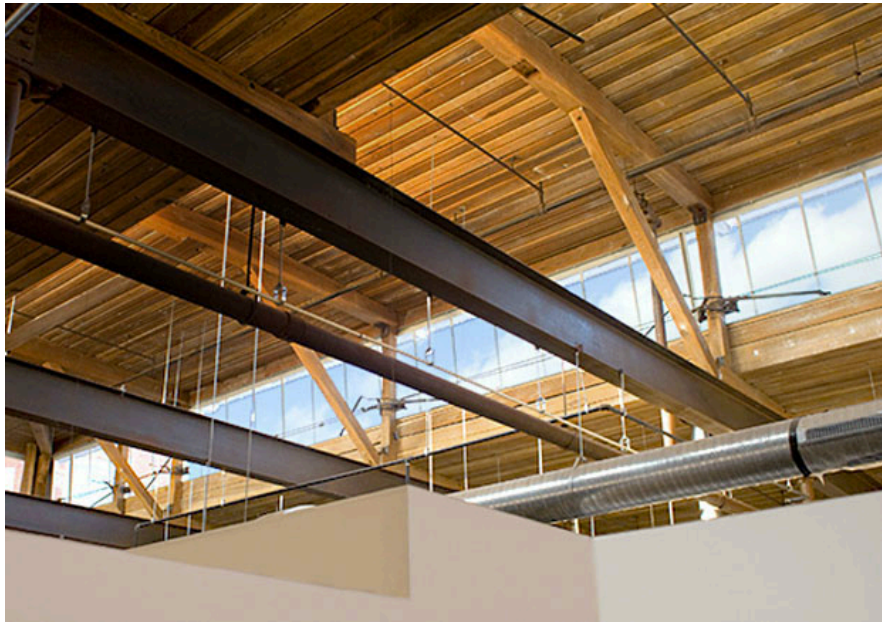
Golden Belt Mill, Building 3. The monitor roof windows were repaired to help retain the character of this particular building. Between the height of the windows and the partial-height walls in proportion to the height of the entire space, Belk Architecture was able to convey the buildings original form, proportion, and scale, as well as provide natural lighting to all of the studio spaces. Courtesy of Scientific Properties.
